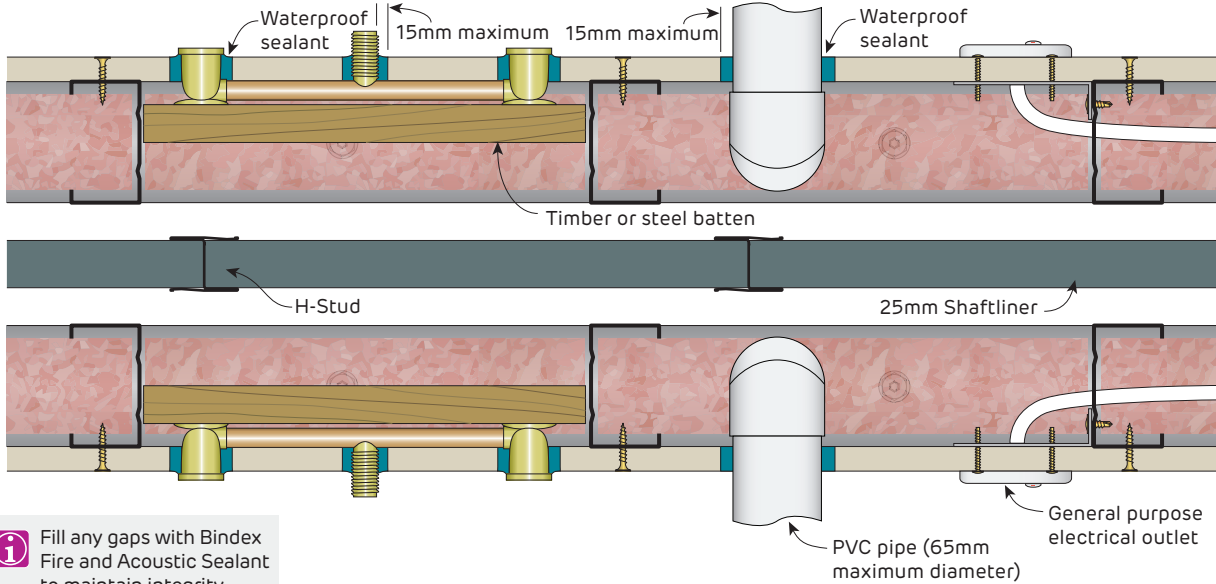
Plumbing and Electrical Penetrations in Wall Linings
